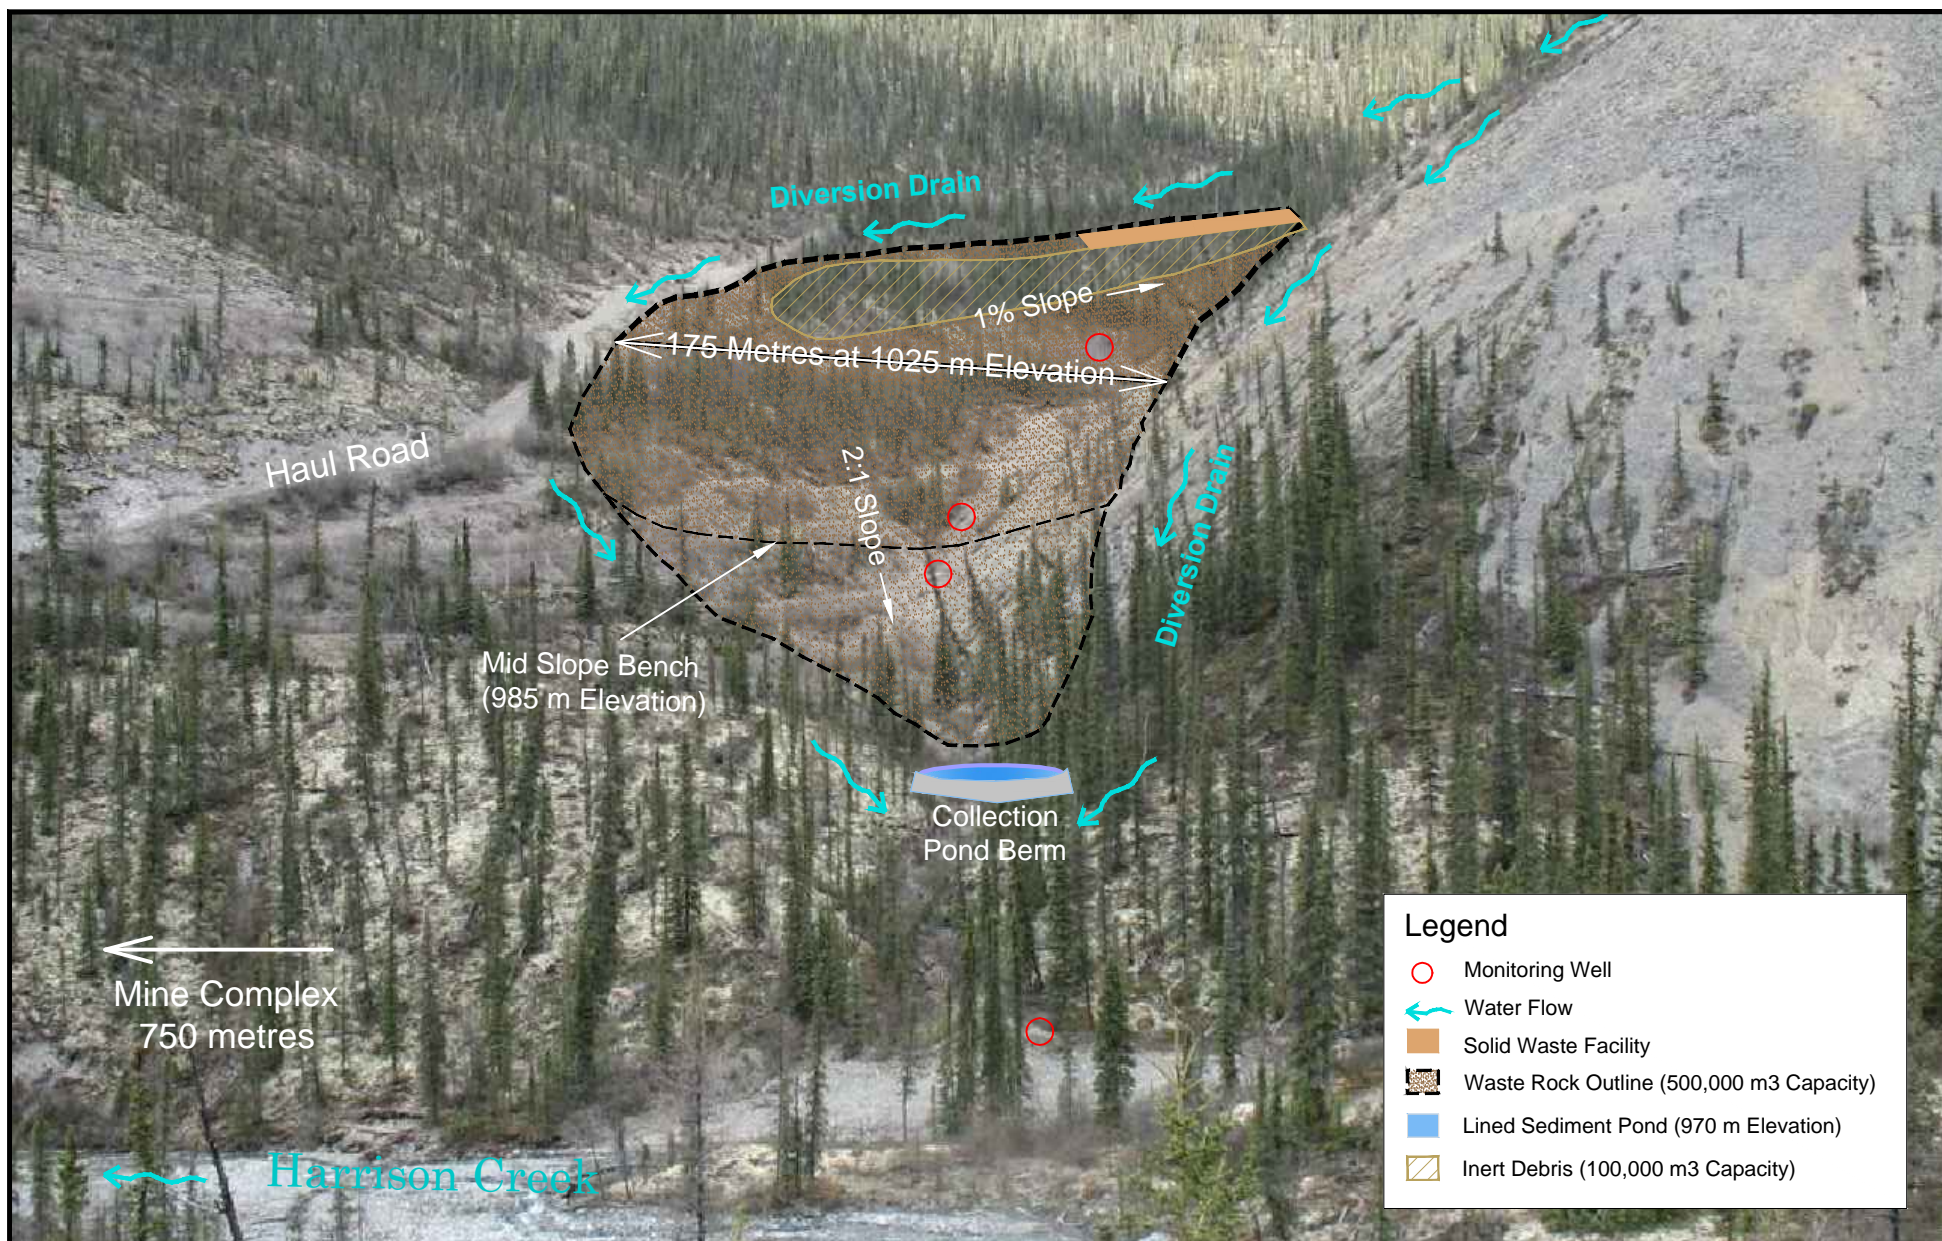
Waste Rock Pile; Conceptual Layout
